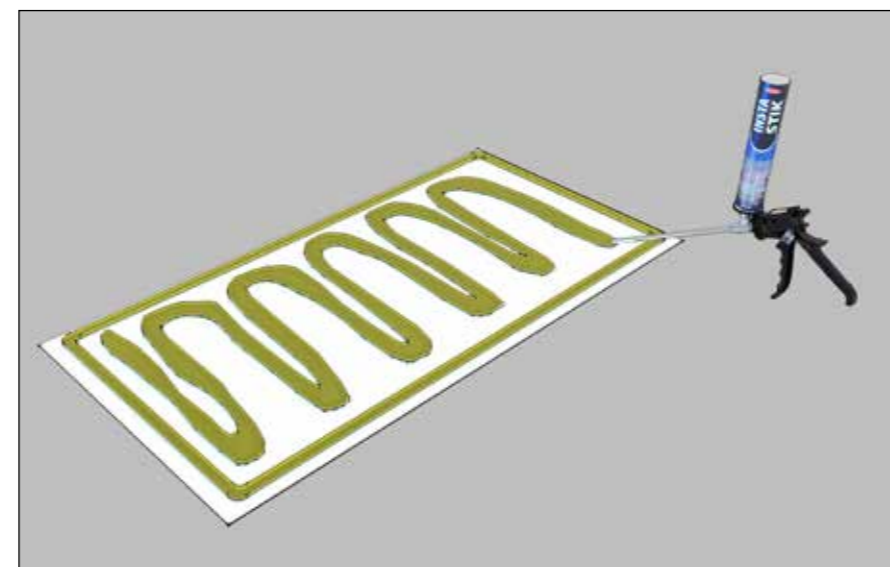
Applying Insta-stik to back of Spacetherm WL board
